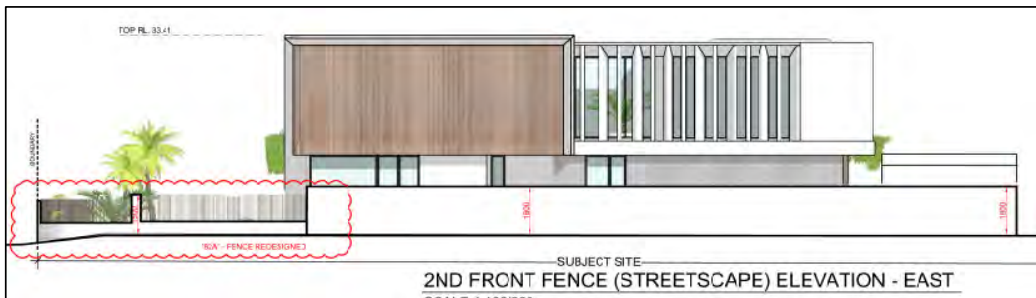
Proposed Woodward Avenue Streetscape/Fence Elevation.
